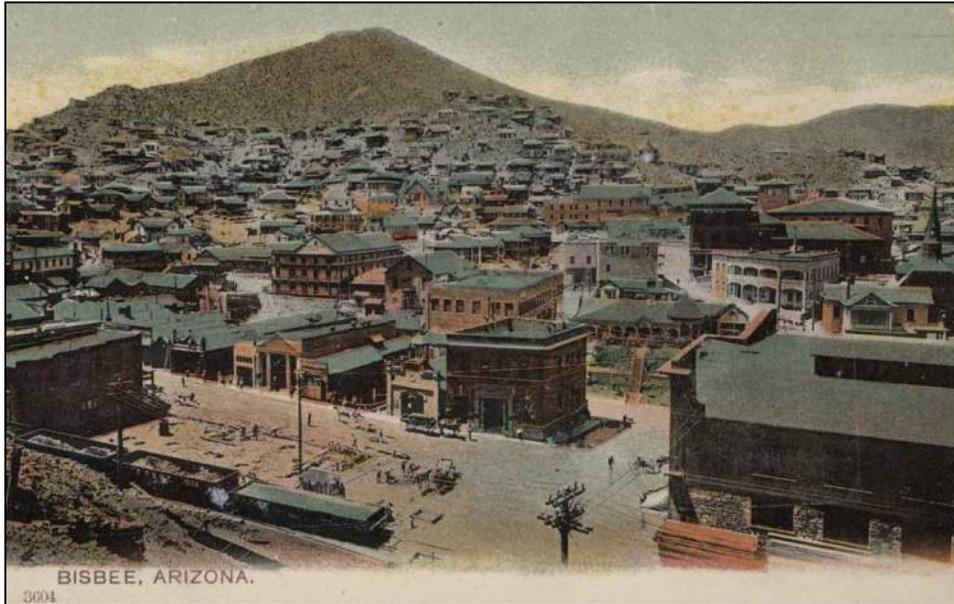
Postcard showing the foundations of the new building in the lower left corner. 1906a Courtesy of Copper Queen Library archives.
